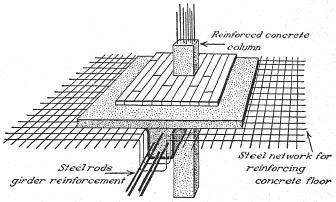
This sketch shows how steel rods are used to reinforce columns, girders, and floors.
